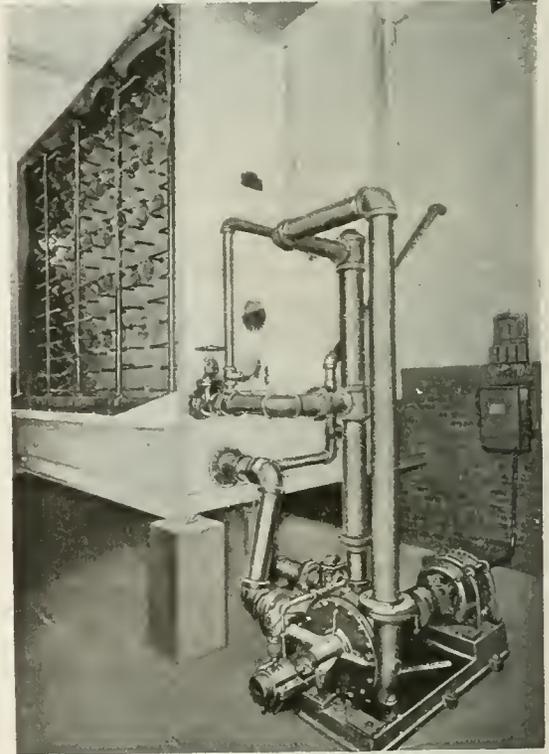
A Spray Engineering Company filter with Motor and Pump
